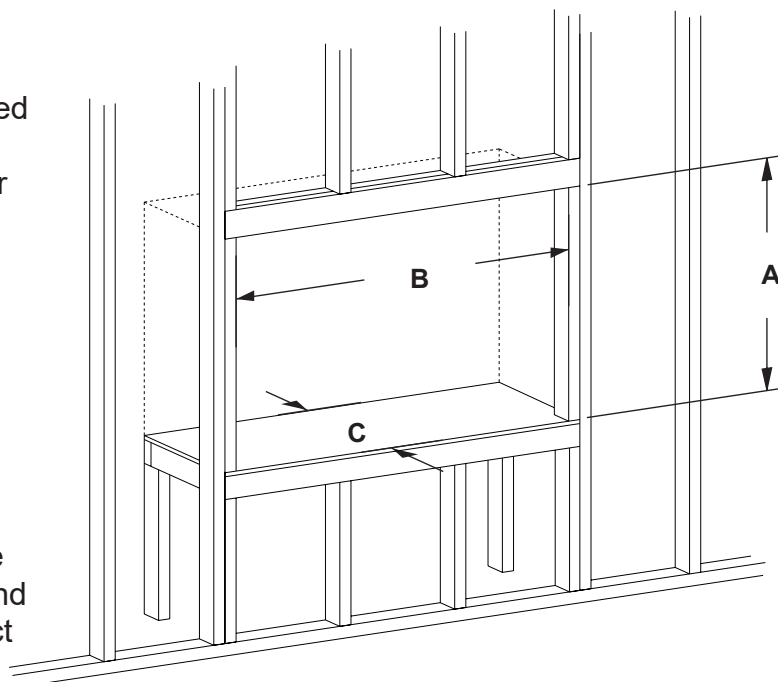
Raised Installation Rough Opening in a Normal Wall
